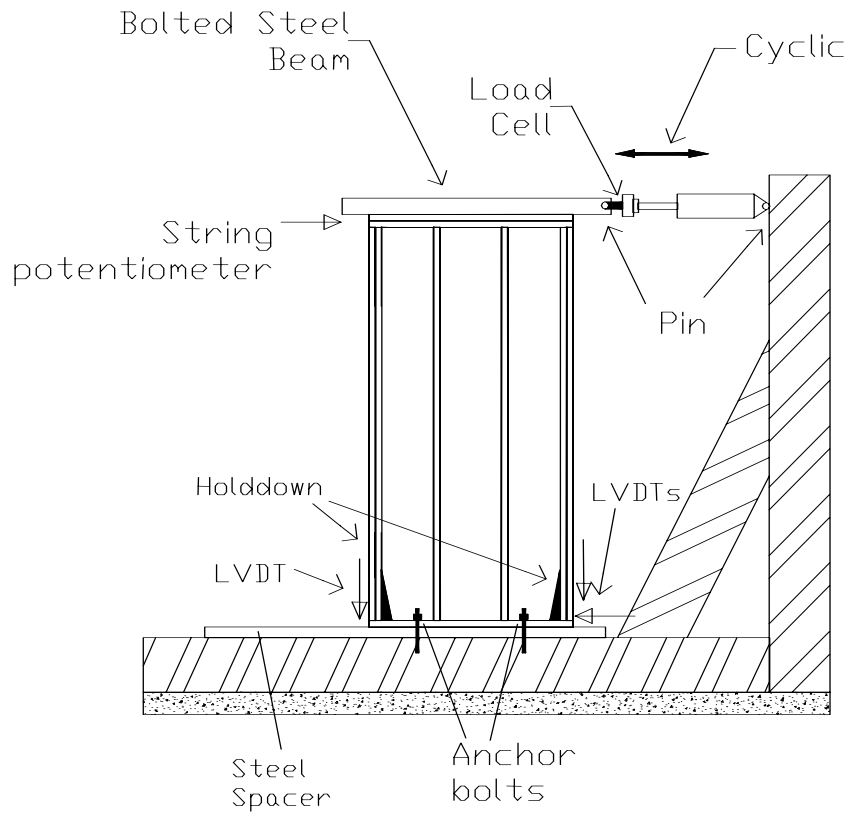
SCHEMATIC OF A TYPICAL SHEARWALL TEST SETUP AND INSTRUMENTATION
